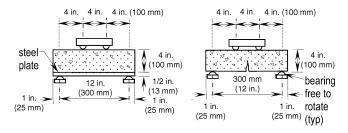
Elevations of an FRC test beam to determine its postcracking strength.
